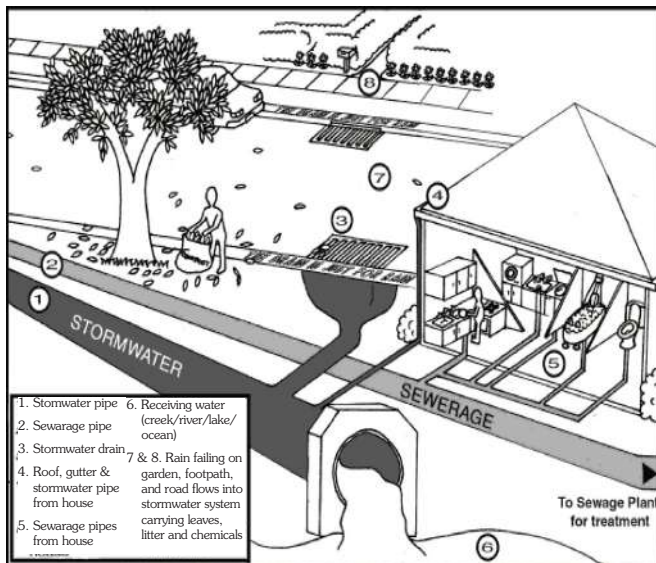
Separate Pipeline Network for Sewerage and Storm Water Collection
